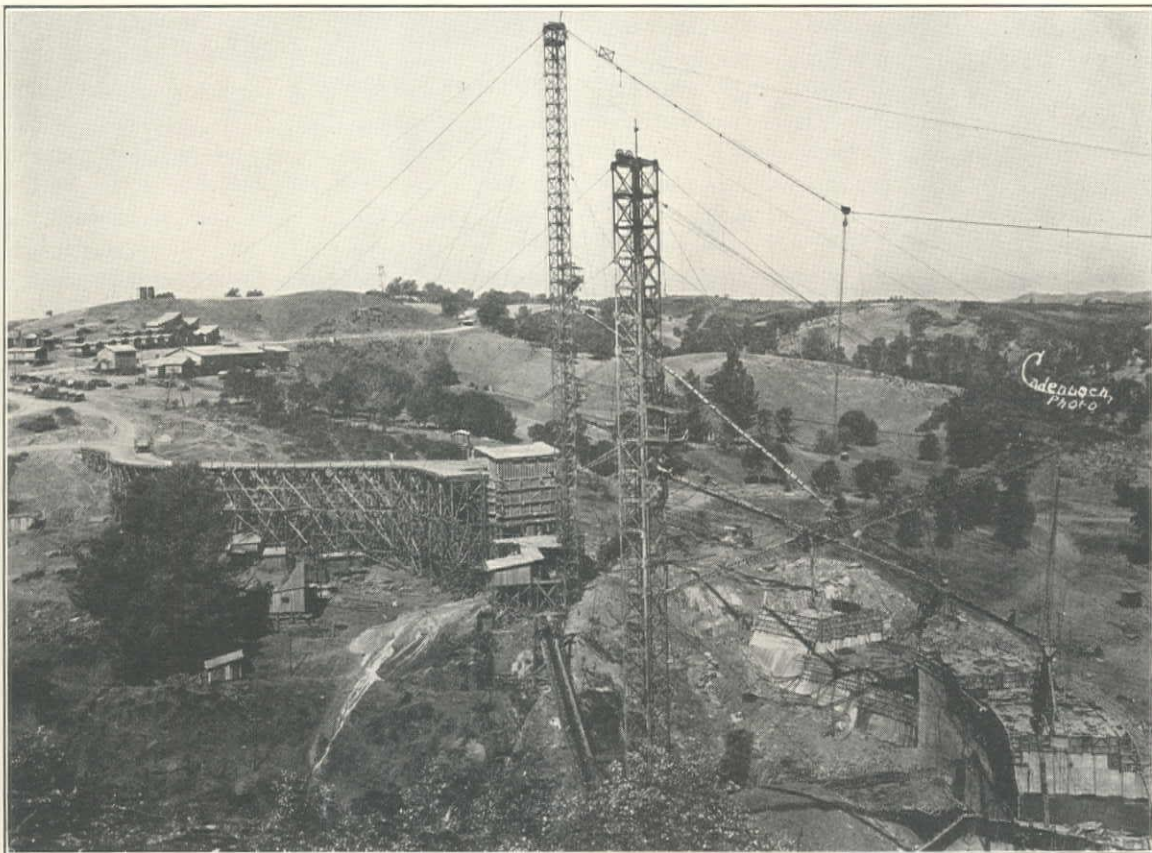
CALAVERAS DAM UNDER CONSTRUCTION. CONCRETE PLACING EQUIPMENT AND VARIABLE-RADIUS ARCH SECTION IN FOREGROUND. TRESTLE AND MIXING PLANT IN CENTER, WITH CAMP IN LEFT BACKGROUND
